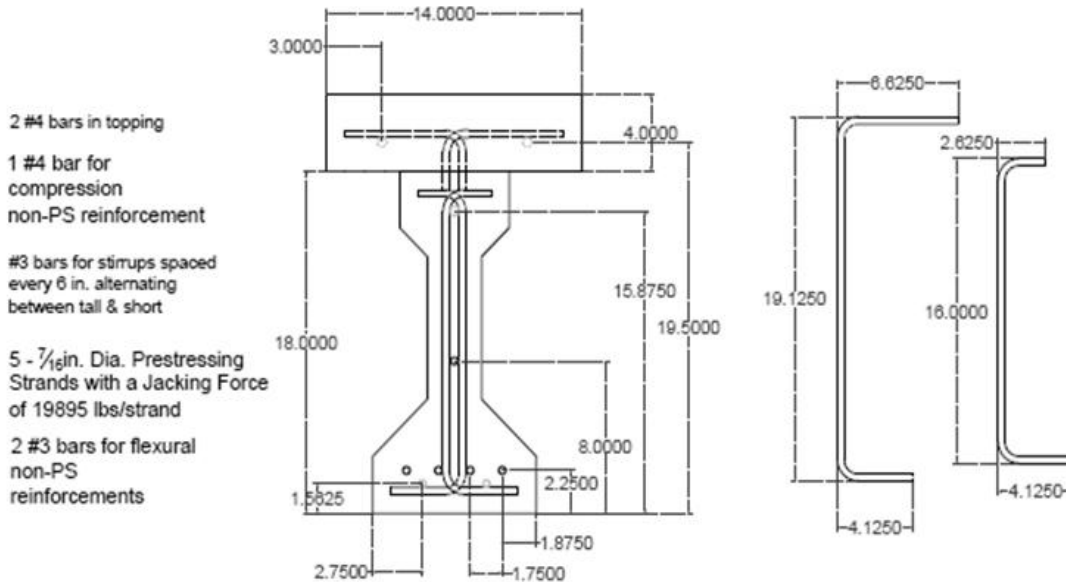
Half Scale PSC test girder cross-section and reinforcements
